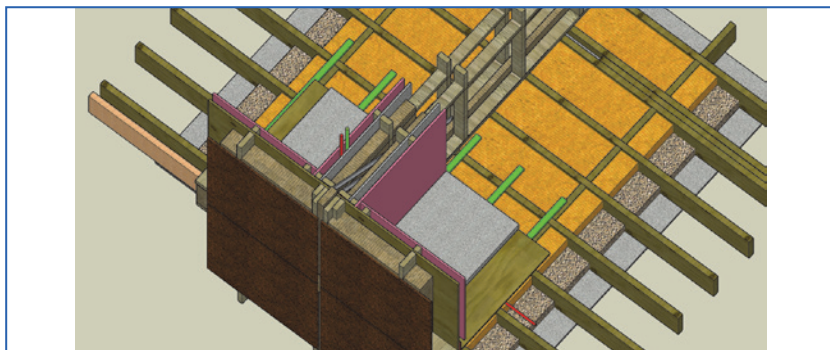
Total concept of the LWTF construction principle for the construction of low rise apartment buildings (max 4 floors, the traditional brickwork of the exterior façade wall is not shown here).
